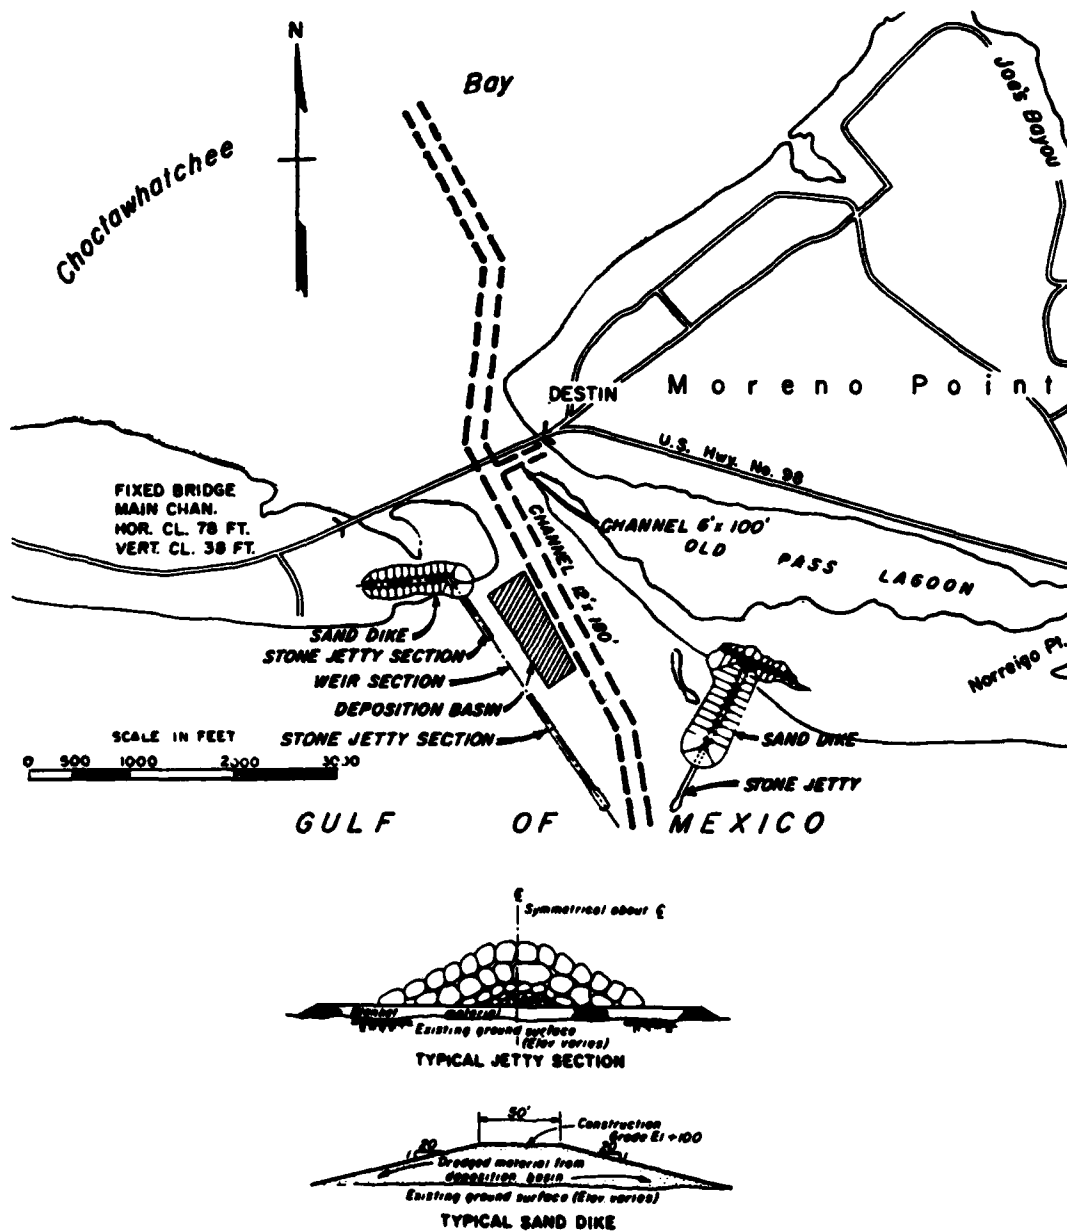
Destin East Pass, Florida, jetty alignment and typical jetty cross section
